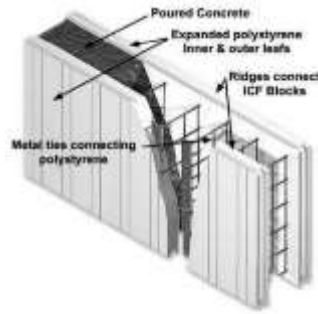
Insulating Concrete Formwork (ICF) or SIPcrete [18]
